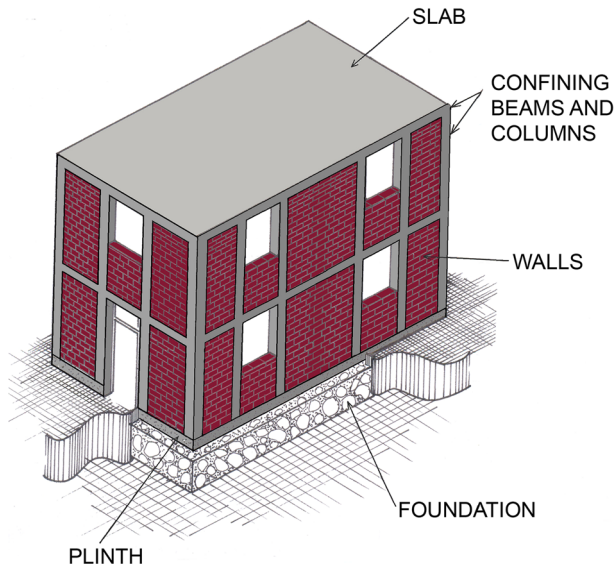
Components of a confined masonry building (Meli et al. 2011)
